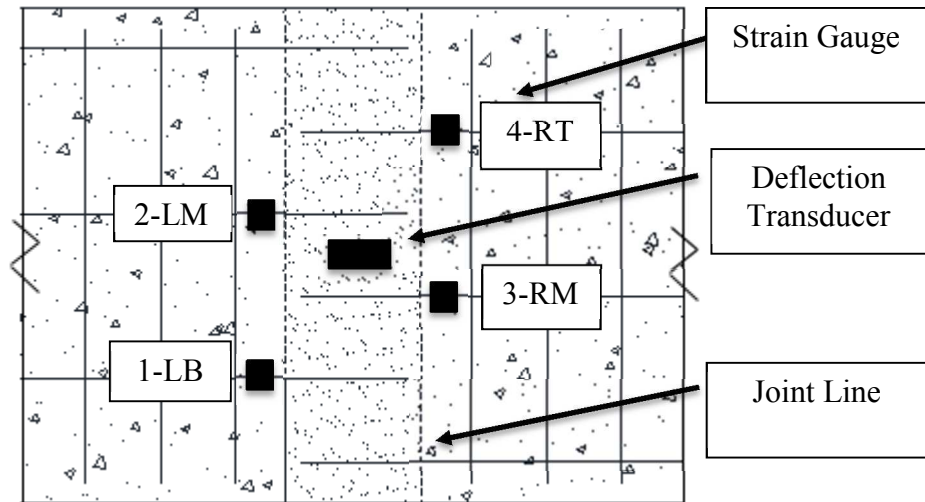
Embedded Instrumentation for Jointed Specimens
